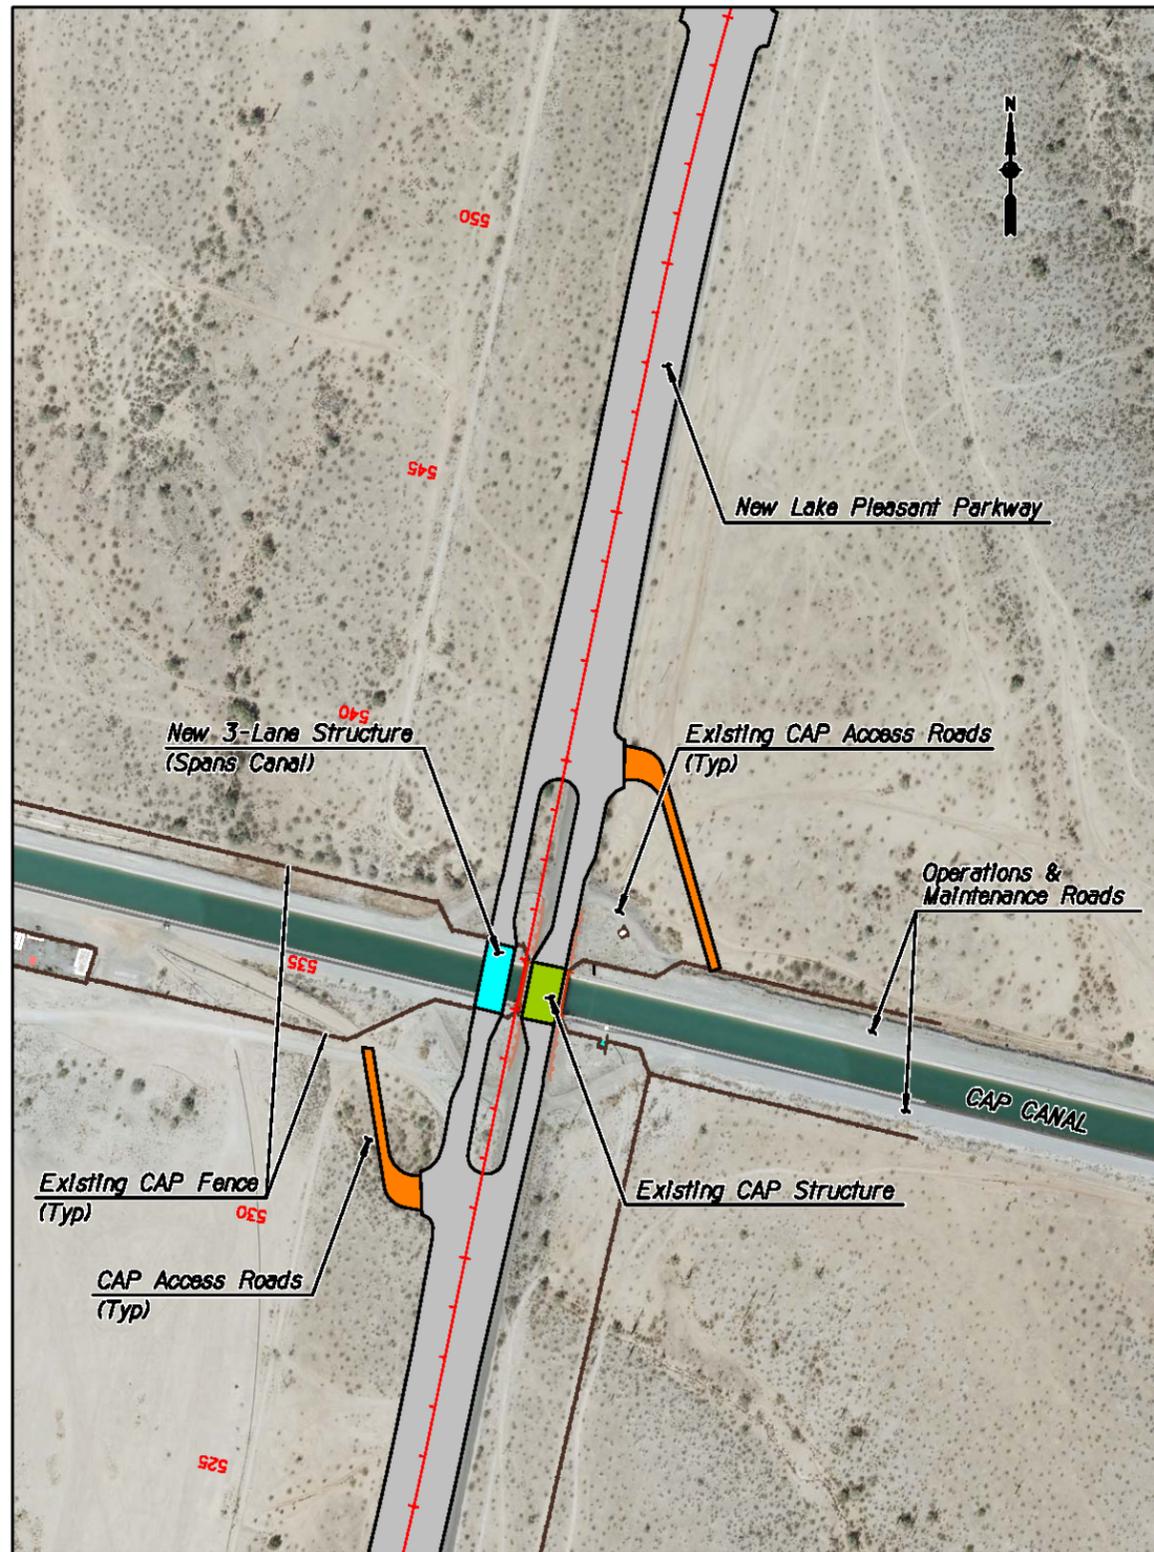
CAP Alternative 6: Access Roads at Grade with Underpass Crossings
